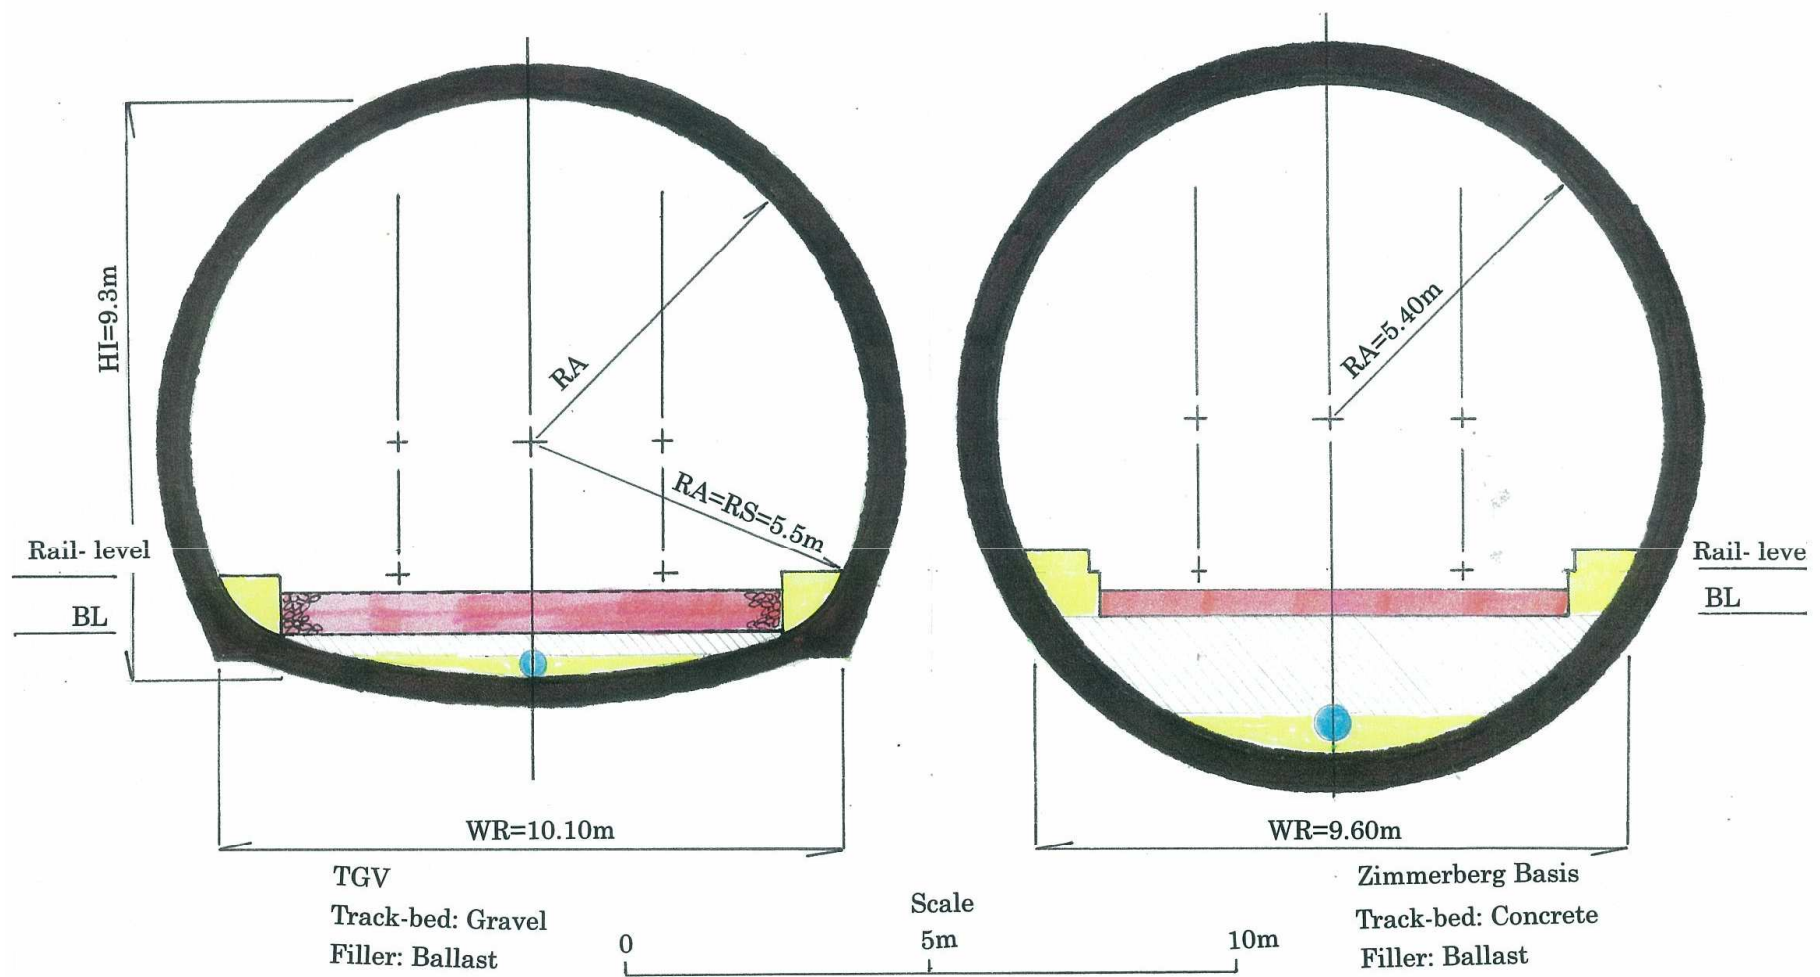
Typical Cross-section of Double Track Tunnels in Europe.
